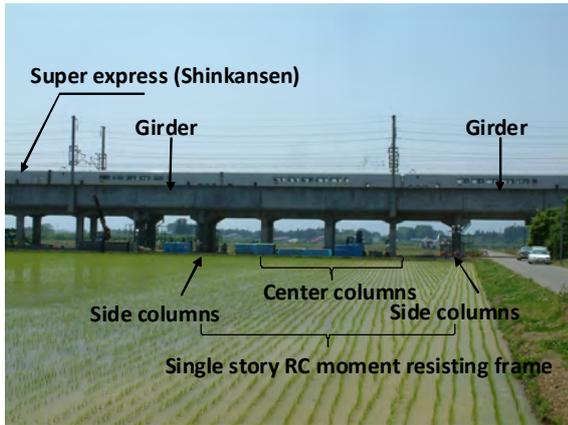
Single story RC moment resisting frame pier with a Gerber girder at both sides
